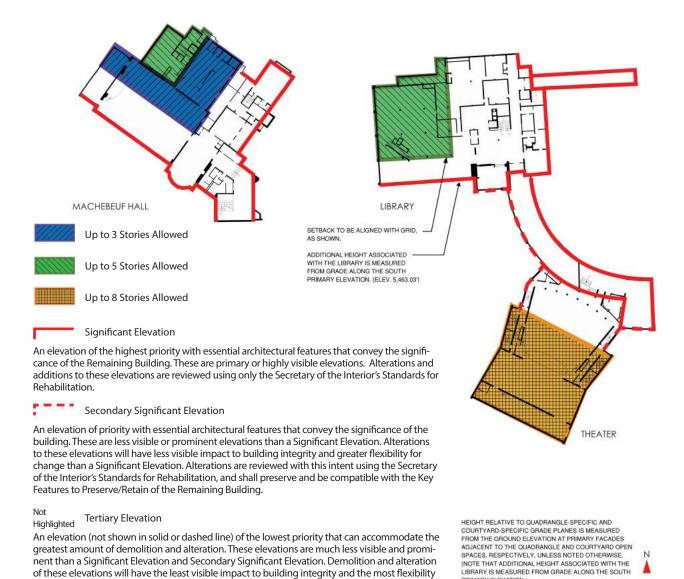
Building Elevations and Potential Addition Locations for Machebeuf Hall and the May Bonfils Stanton Theater & Library
